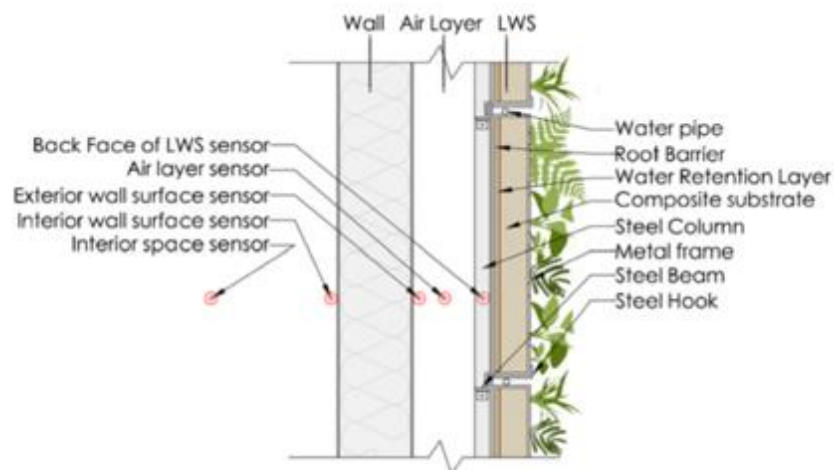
Living wall system [LWS] details. (Source: Chen, Li and Liu, 2013)
